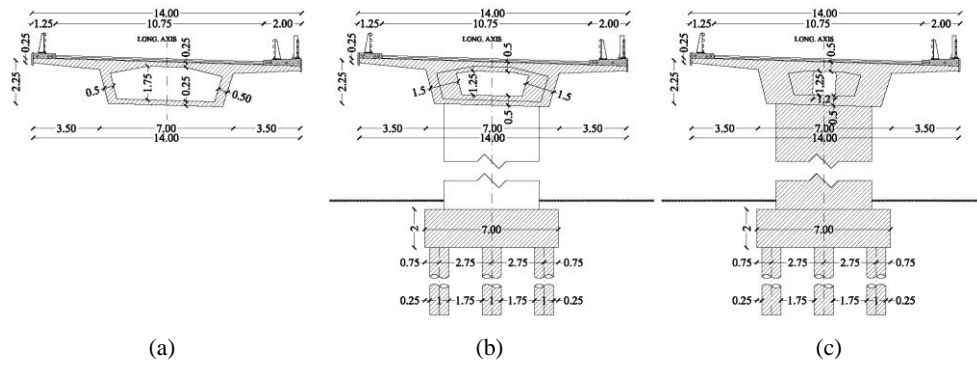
Cross-section of the deck of the integral bridge (a) at the mid-span, (b) near the pier and (c) at the pier
